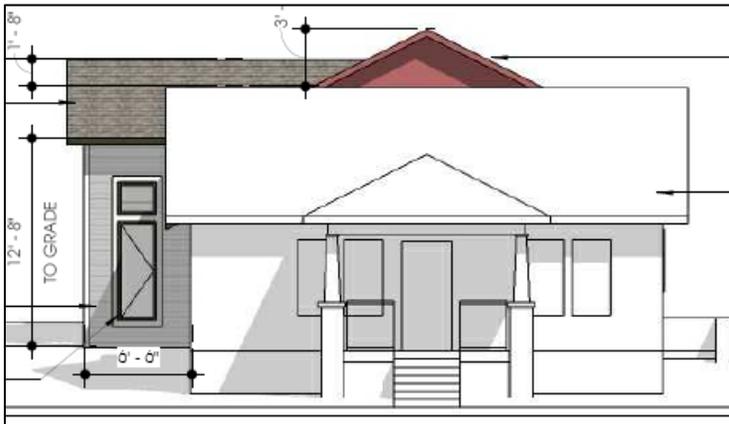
Front elevation. The proposed addition extends to the side and above the existing ridge line.
